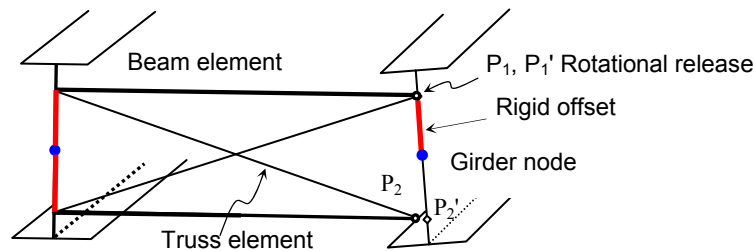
Finite element model for the cross section transition at girder splice location
